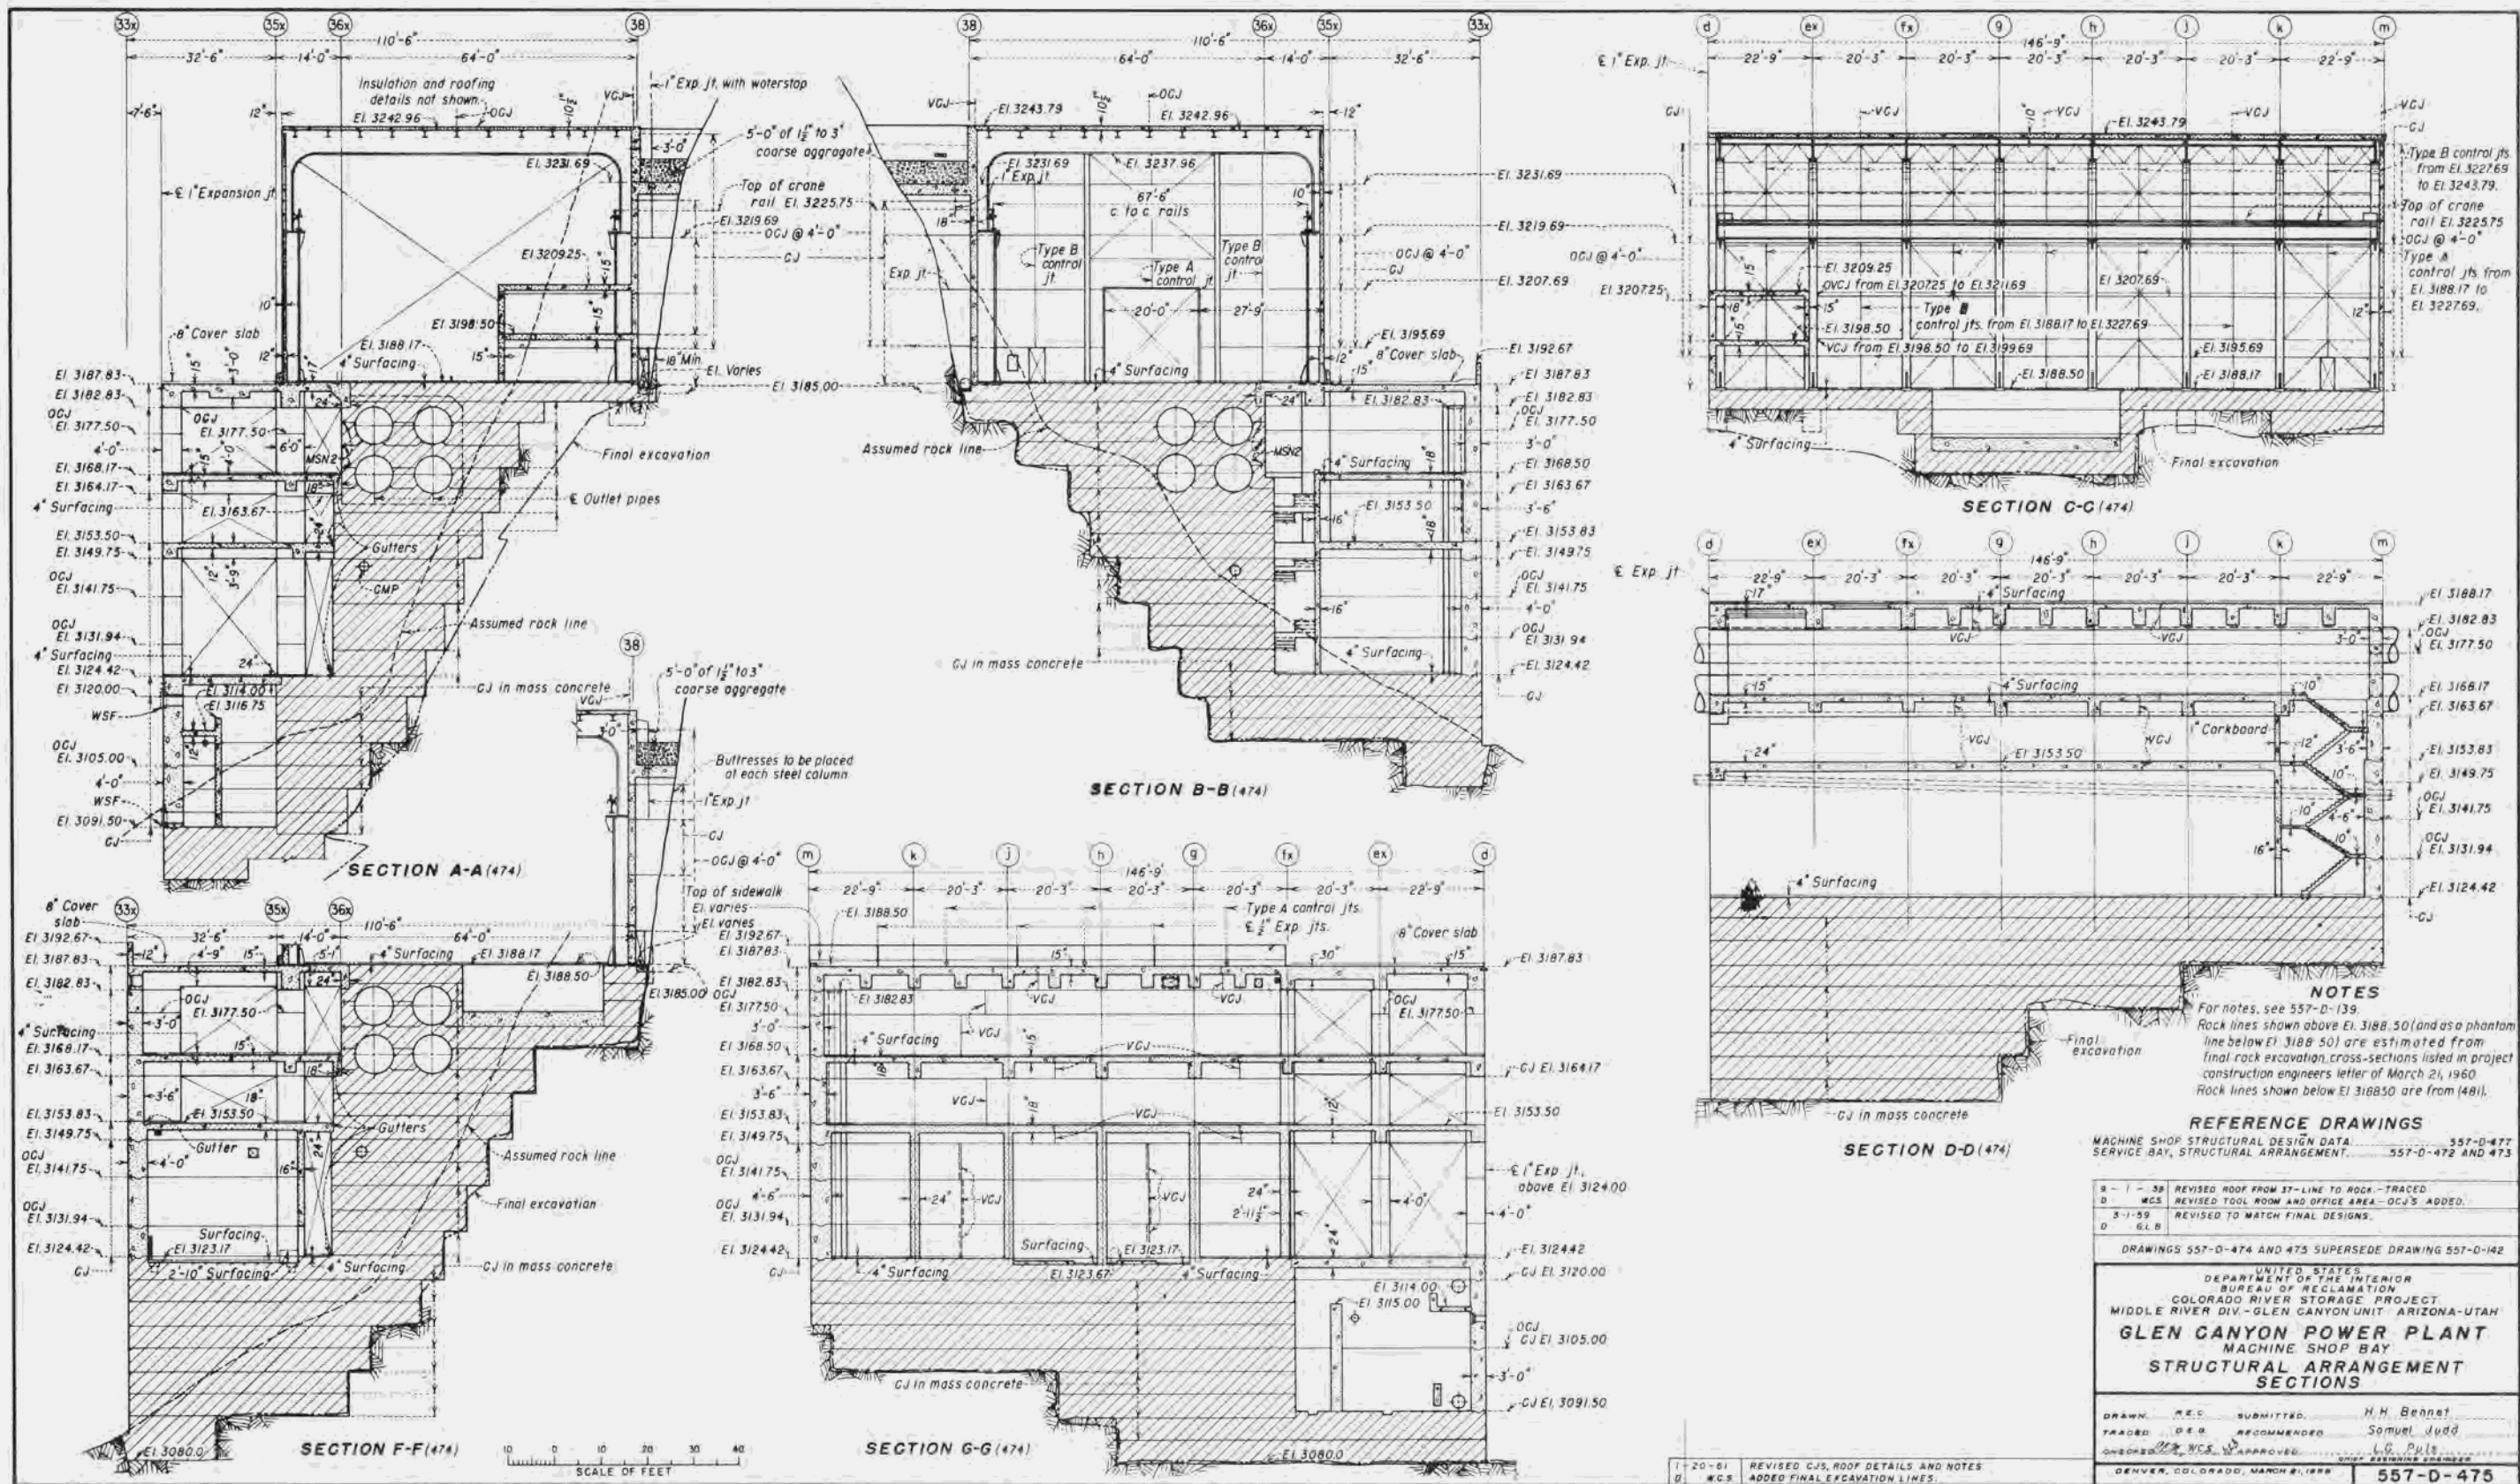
Powerplant structural arrangement sections—Machine shop bay.
